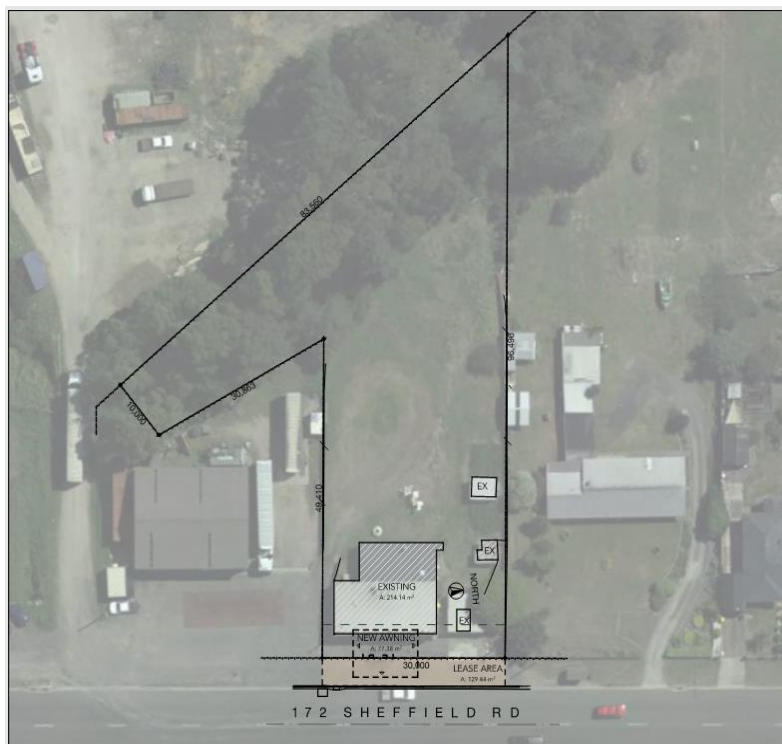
Title Plan of 172 Sheffield Road CT-30223/5 (The List, 1986)
